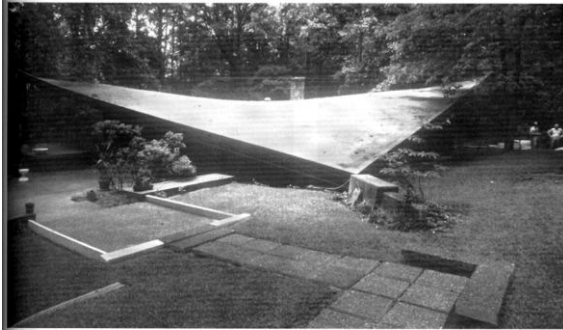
Residence with hyperbolic paraboloid roof, designed by architect Eduardo Catalano, in Raleigh, North Carolina.
